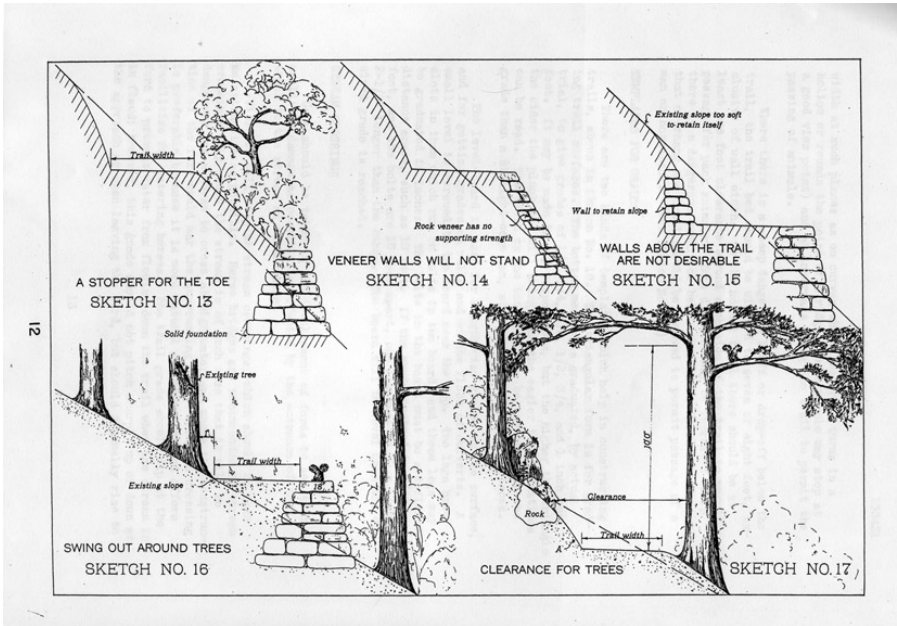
The 1937 manual, *Construction of Trails*, shows proper construction of retaining walls around trees, dissuades use of walls above the trail, and suggests a 10-foot clearance for horses. (Shenandoah NP Archives)
